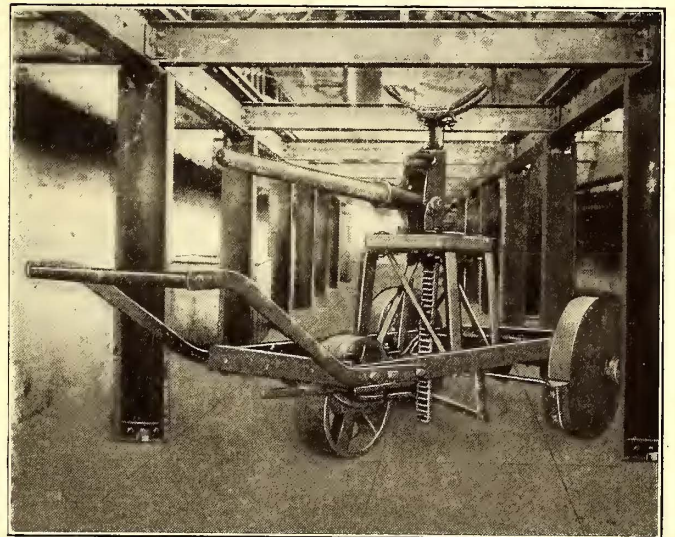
WAGON FOR HANDLING ARMATURES IN THE PIT
